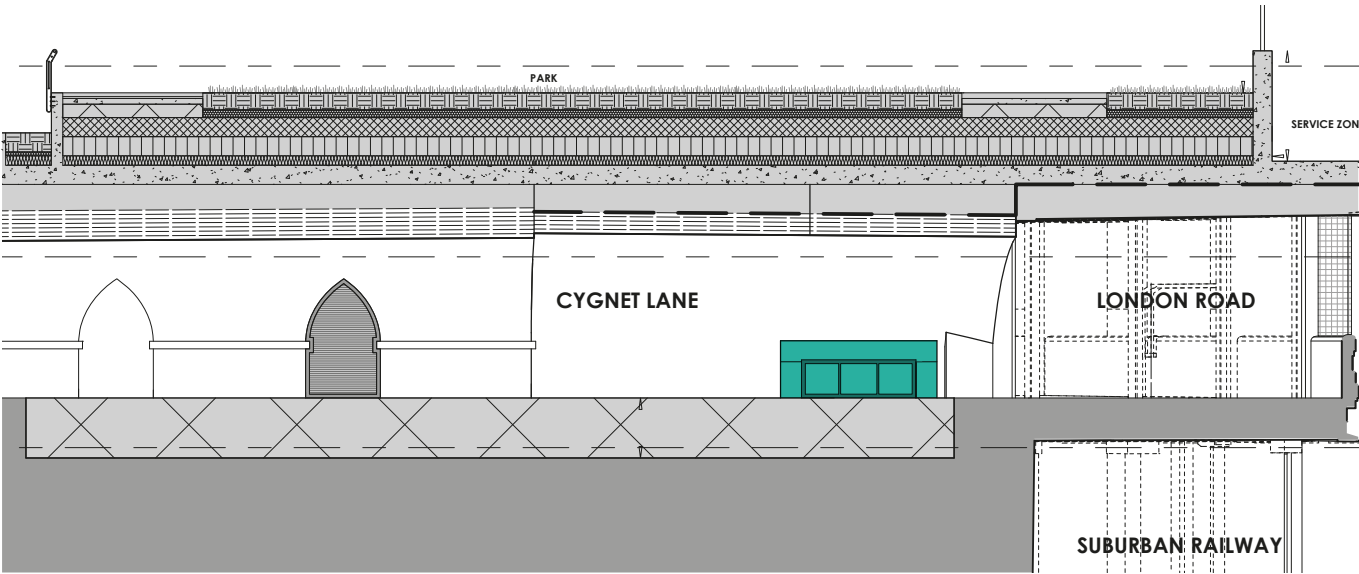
Proposed new opening - Cygnet Lane elevation
